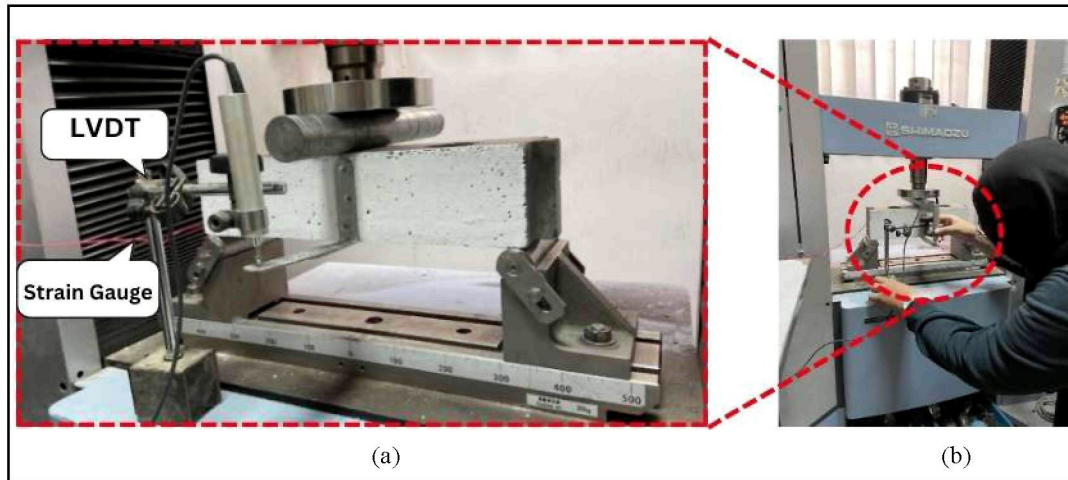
Installation of Strain Gauge and LVDT with Universal Testing Machine (UTM): (a) The enlargement; (b) Test Setup
